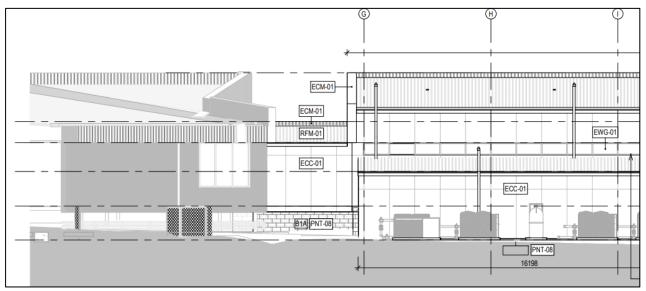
Extract from south elevation illustrating the height of the proposed pool facility (right) aligning with the existing building (left) (*Source: External Elevations, prepared by Populous, dated 15 December 2023*)
